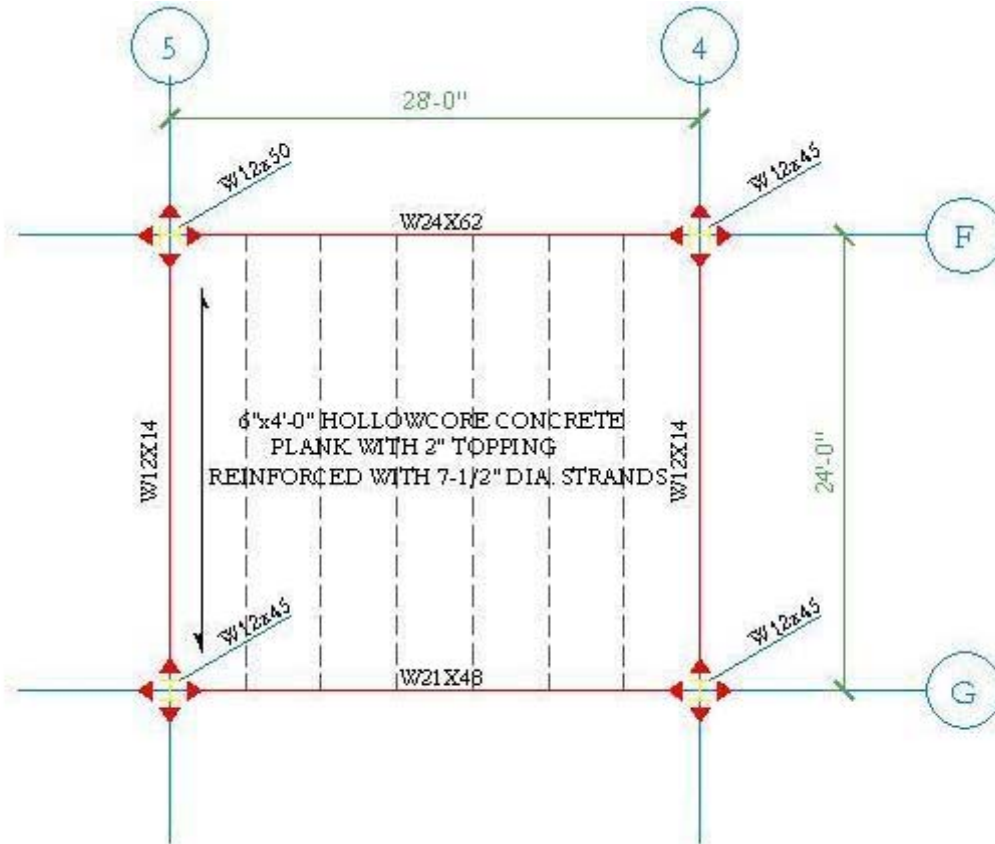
Precast Hollowcore Concrete Plank Typical Floor Framing Bay
